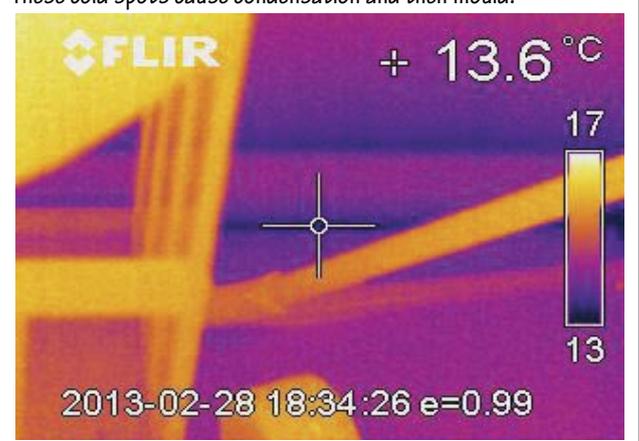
and 4 indicating cold spots at ceiling and wall junctions.
